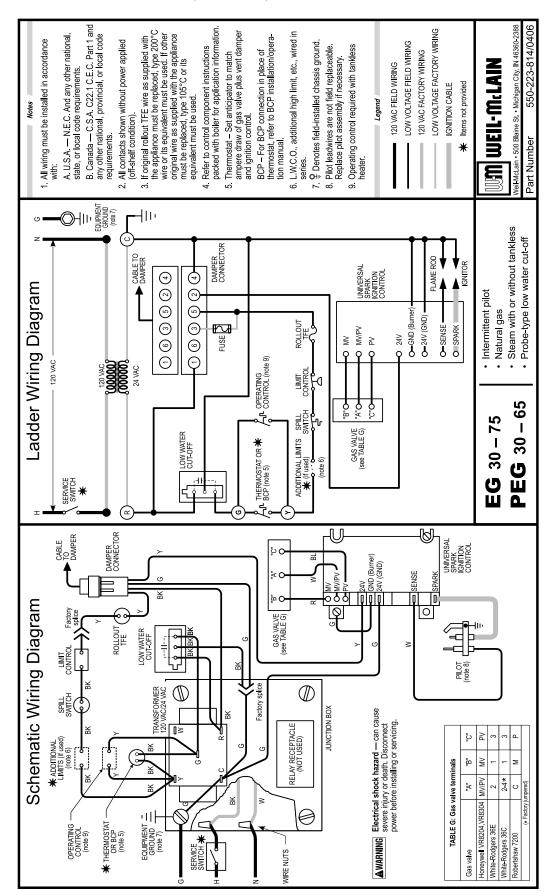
EG and PEG steam boilers with probe-type low water cut-off
